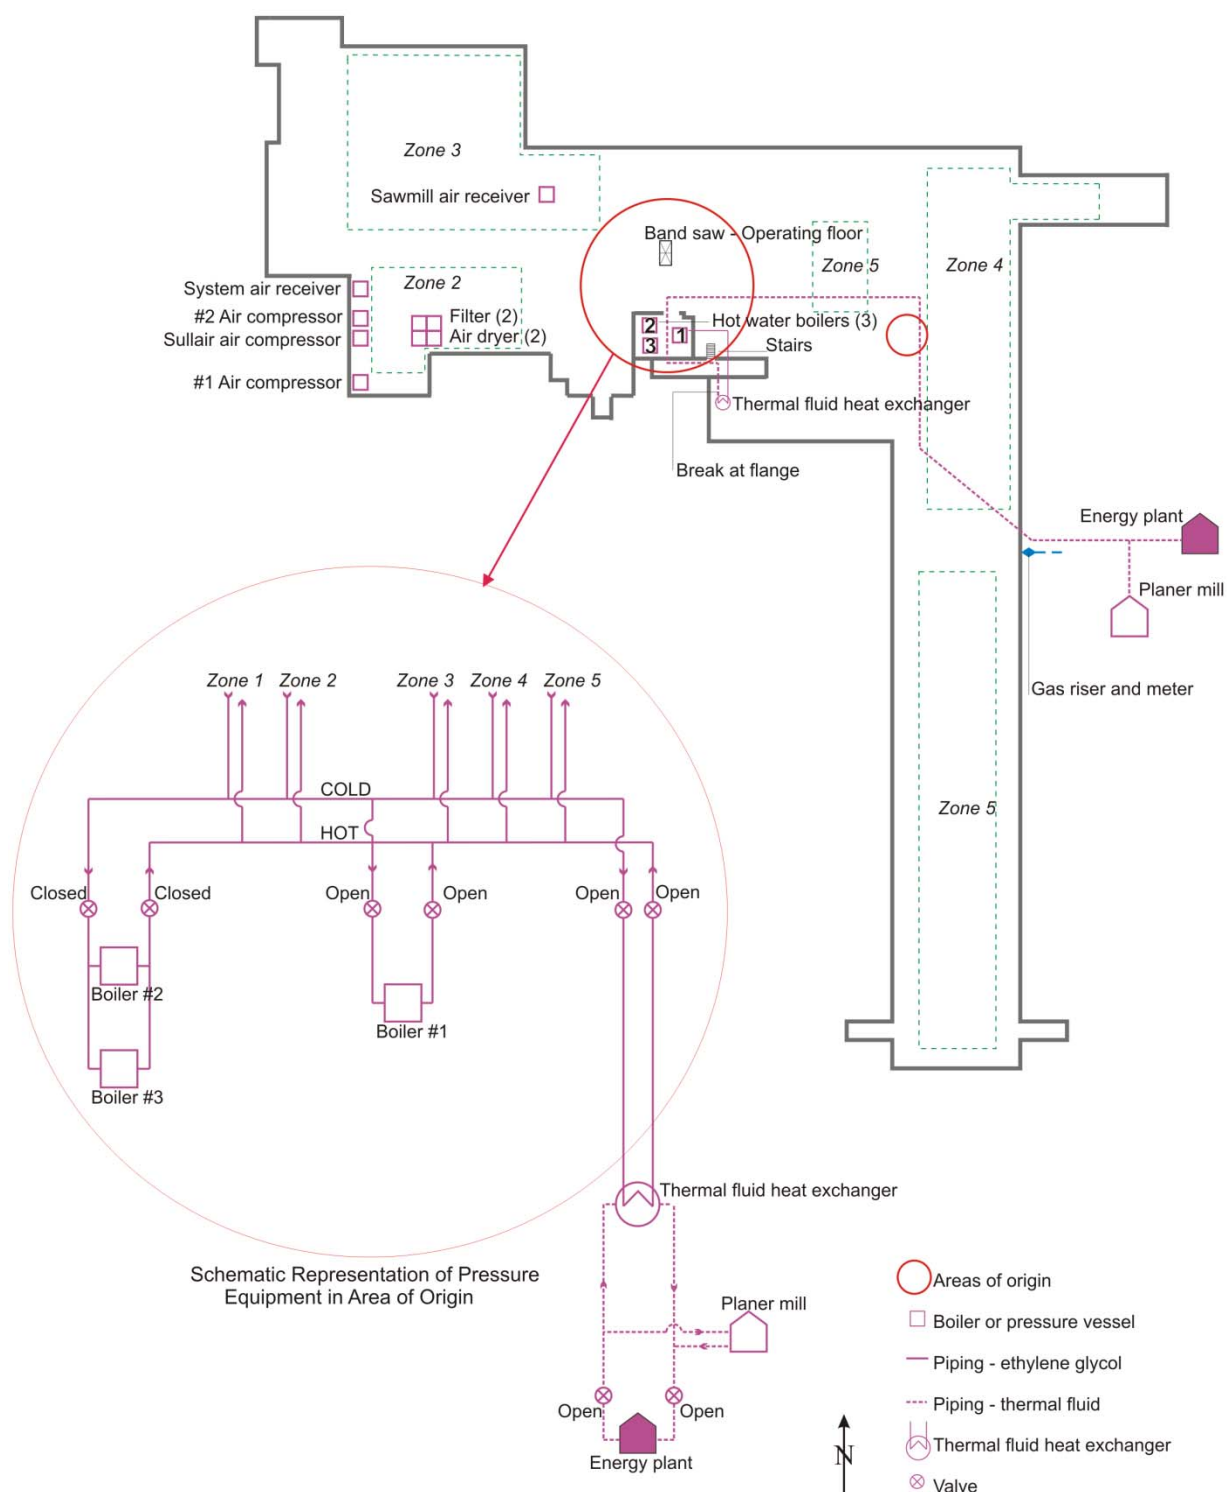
Plan view of mill - boiler and pressure vessel equipment
